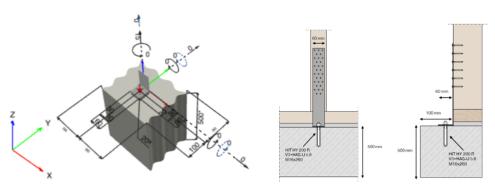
Timber wall to concrete slab fastening via holdown: PROFIS Engineering model and sketch of connection geometry
